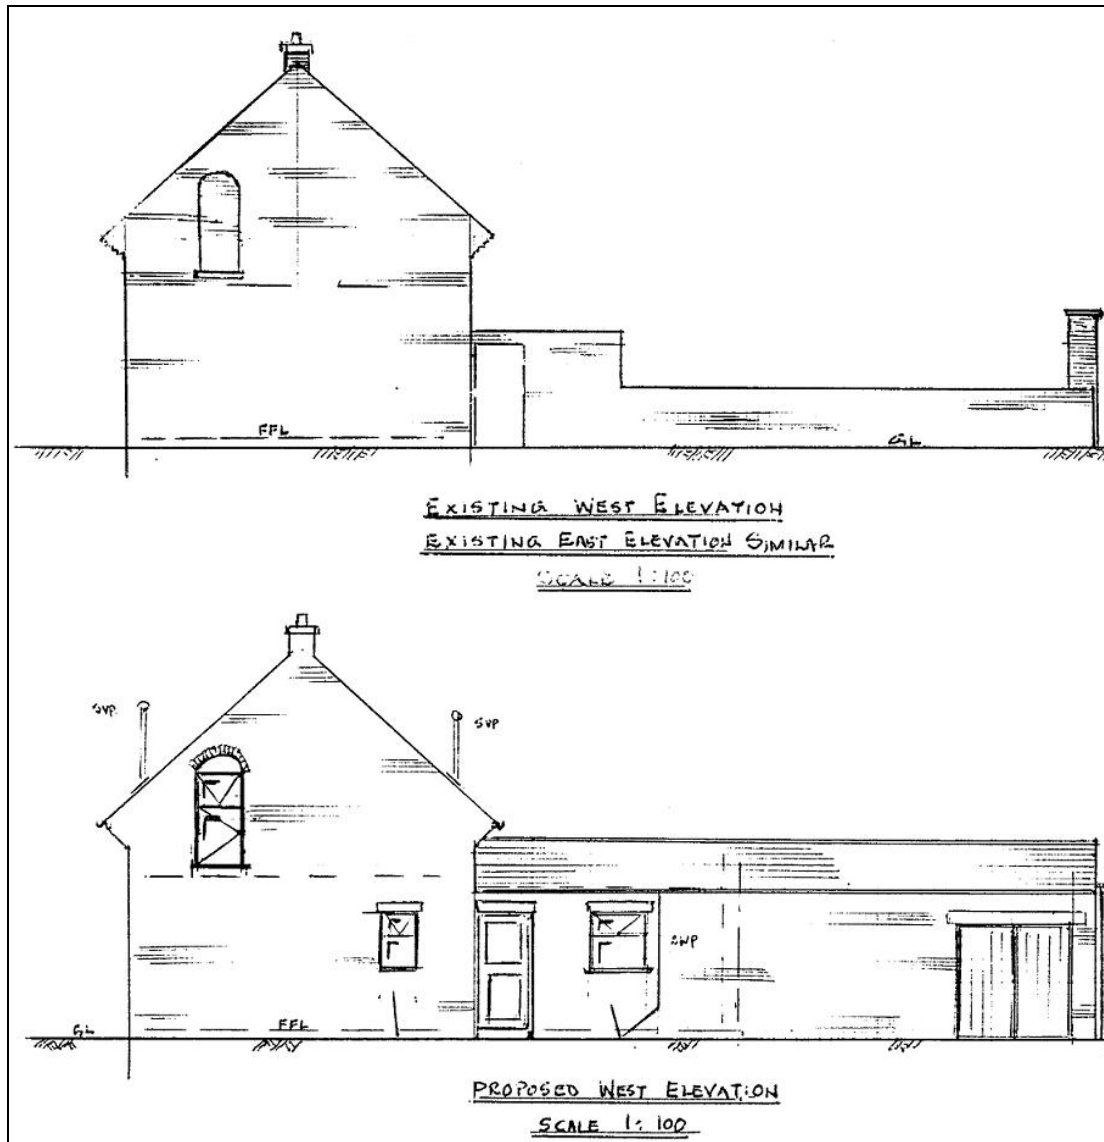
Plan of the existing & proposed west elevation (supplied by client)
